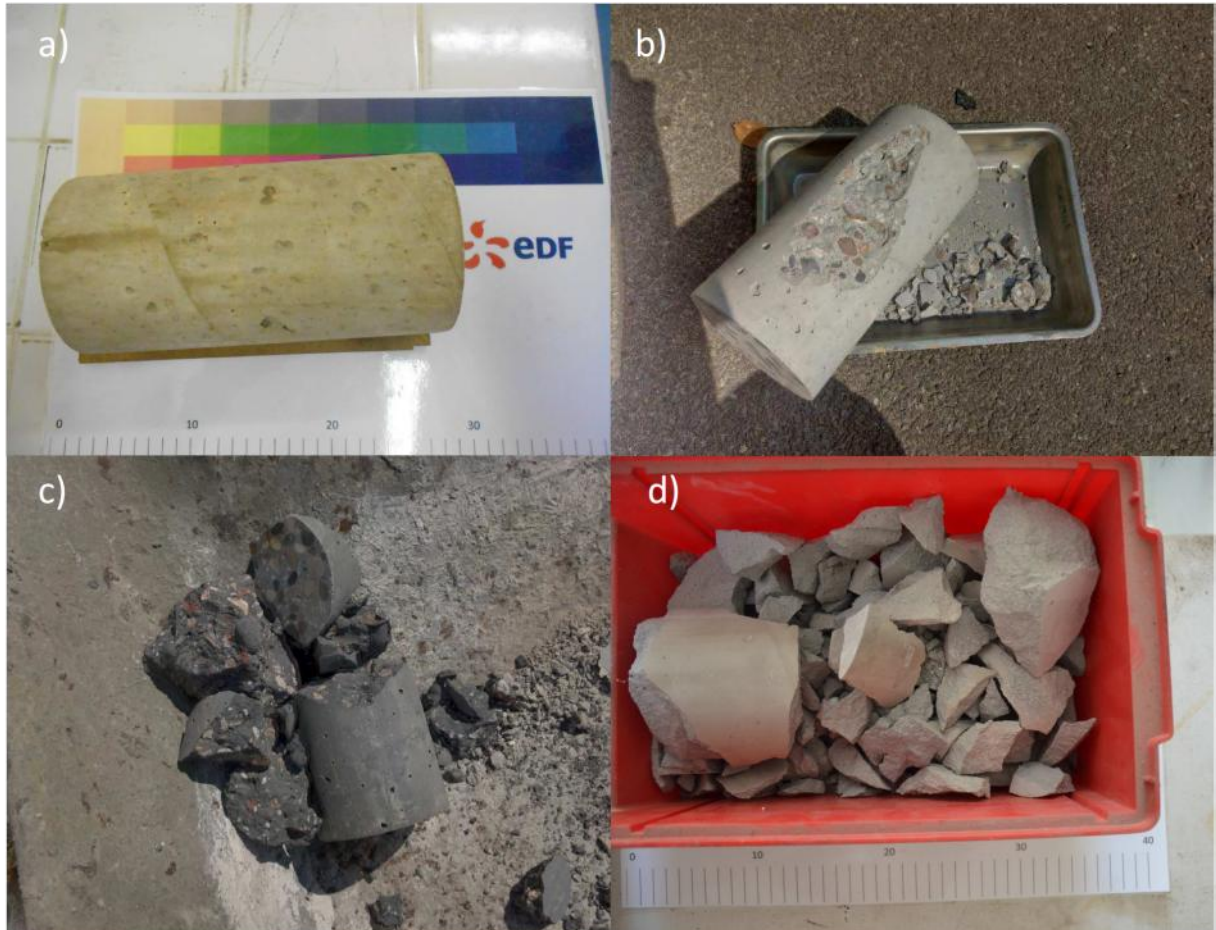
Photos of thermal spalling phenomena: a) no spalling / b) surface spalling / c) non-explosive spalling / d) explosive spalling
